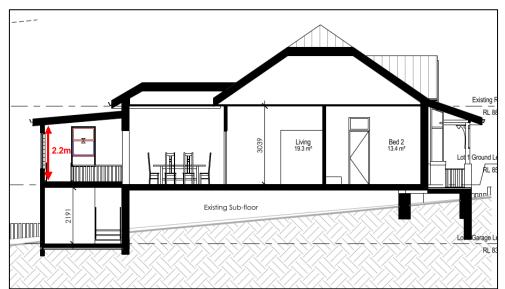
Section plan of existing dwelling showing non compliant floor to ceiling height of 2.20 metres
